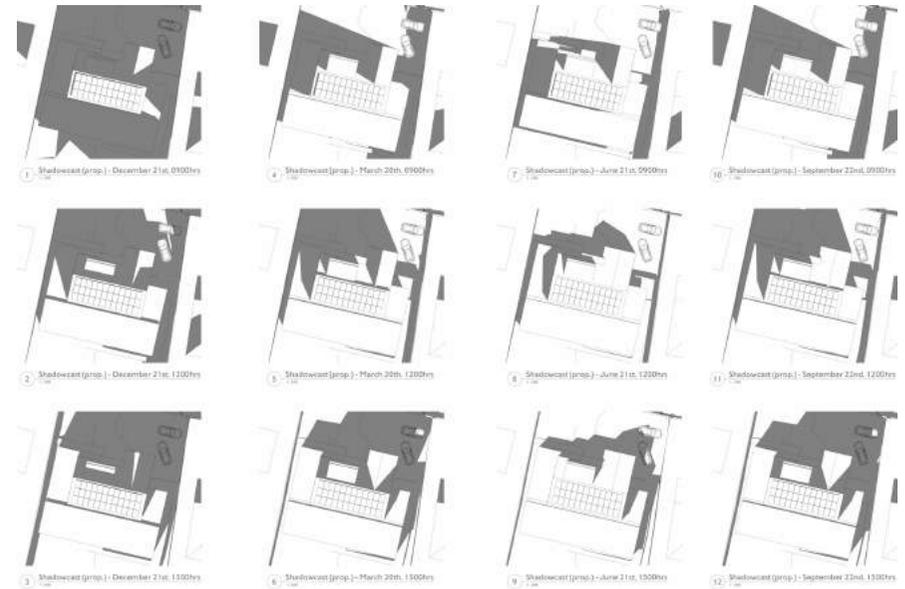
Corresponding roof plan shadowcast studies for the PROPOSED building. The simple gable form south facing roof slope (shorn of two storey extension) receives full sun throughout the year. The increased width afforded by gabling the roof maximises the size of the PV array.
